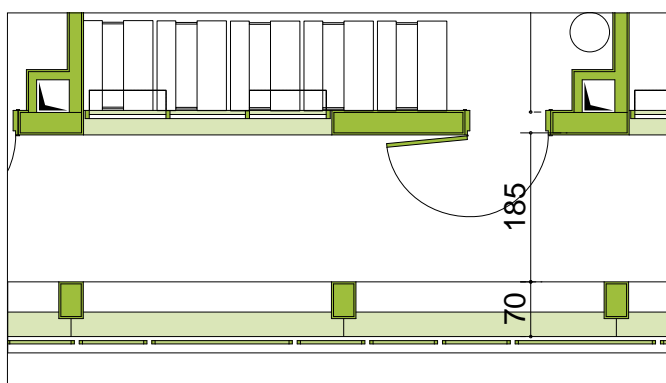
PU's fourth system of classroom wall (Jad Allah Shnan)
